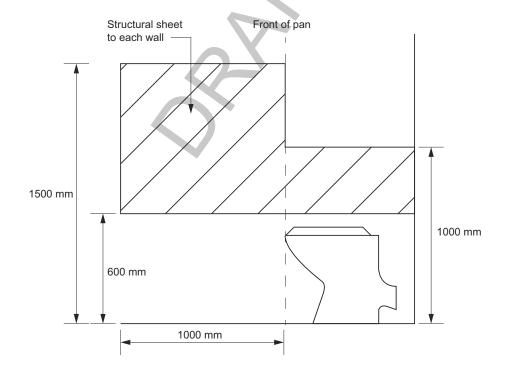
Location of noggings for a wall behind a toilet pan
